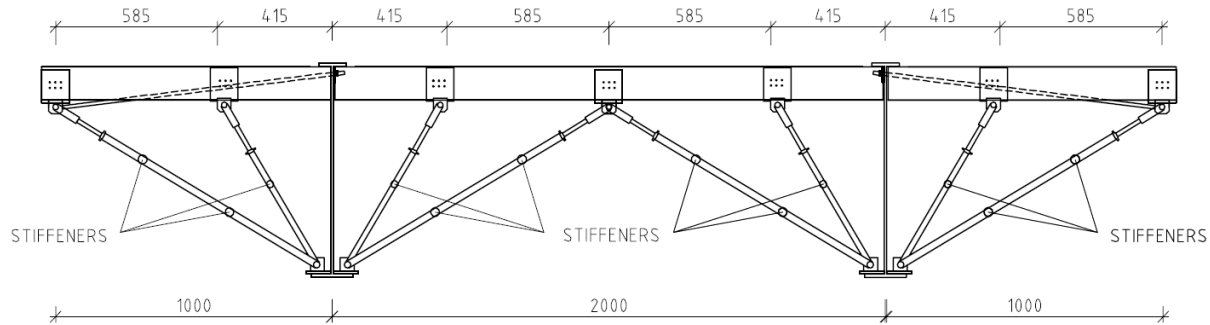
Cross section with displayed longitudinal stiffeners attached between formworks (BRITEK Ltd)
